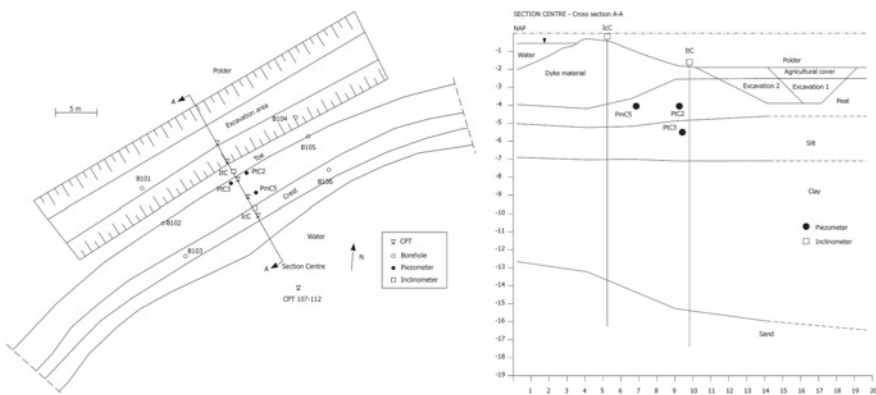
The location of the excavations (left); The cross section of the dyke, including the position of the installed instrumentation (right)
